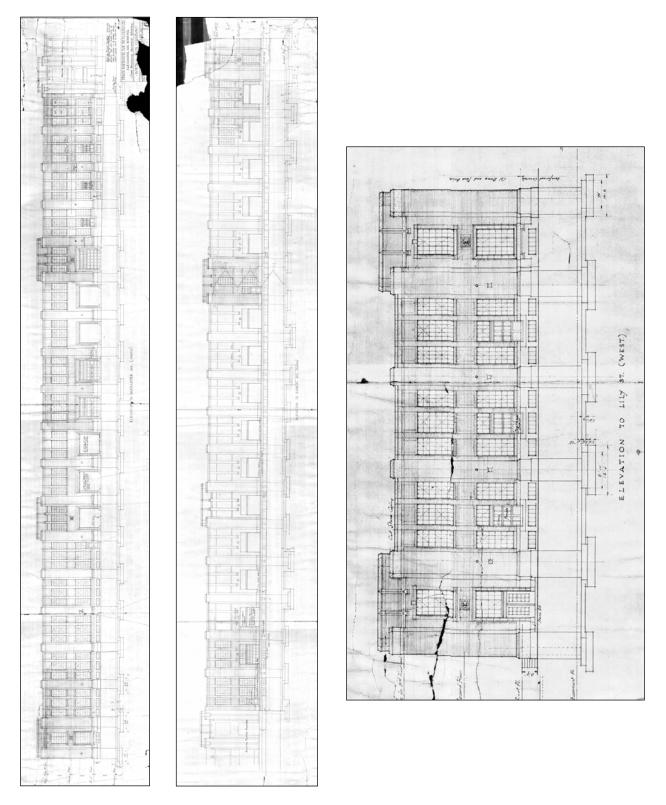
T. Eaton's Company Printing Plant & Track Warehouse, 130 Galt Avenue: "Elevation to Alexander Ave. (South)" (left); "Elevation to Robert Ave. (North)" (middle); and "Elevation to Lily St. (West)" (right). 1927. (City of Winnipeg, Plan No. 2246/1927.)
